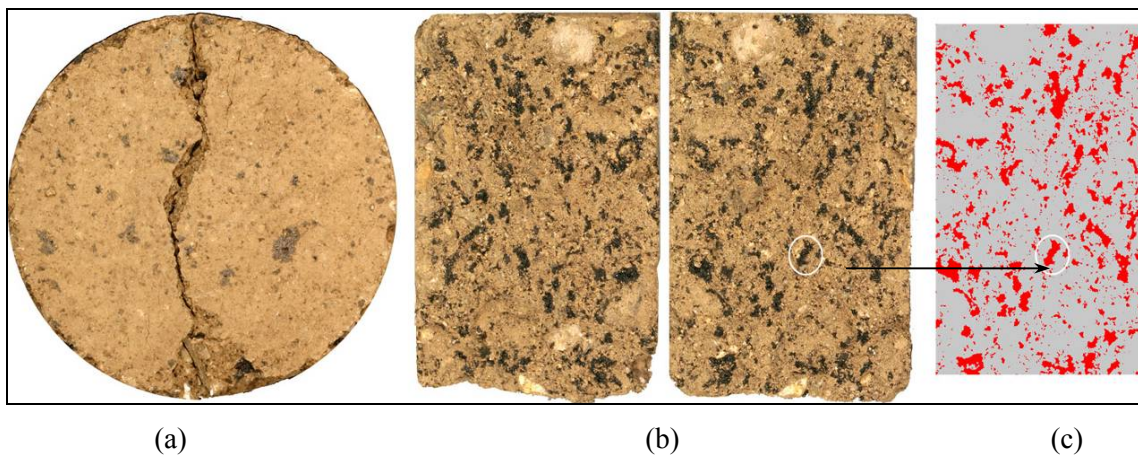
Tested ITS specimen and resulting fracture faces.
